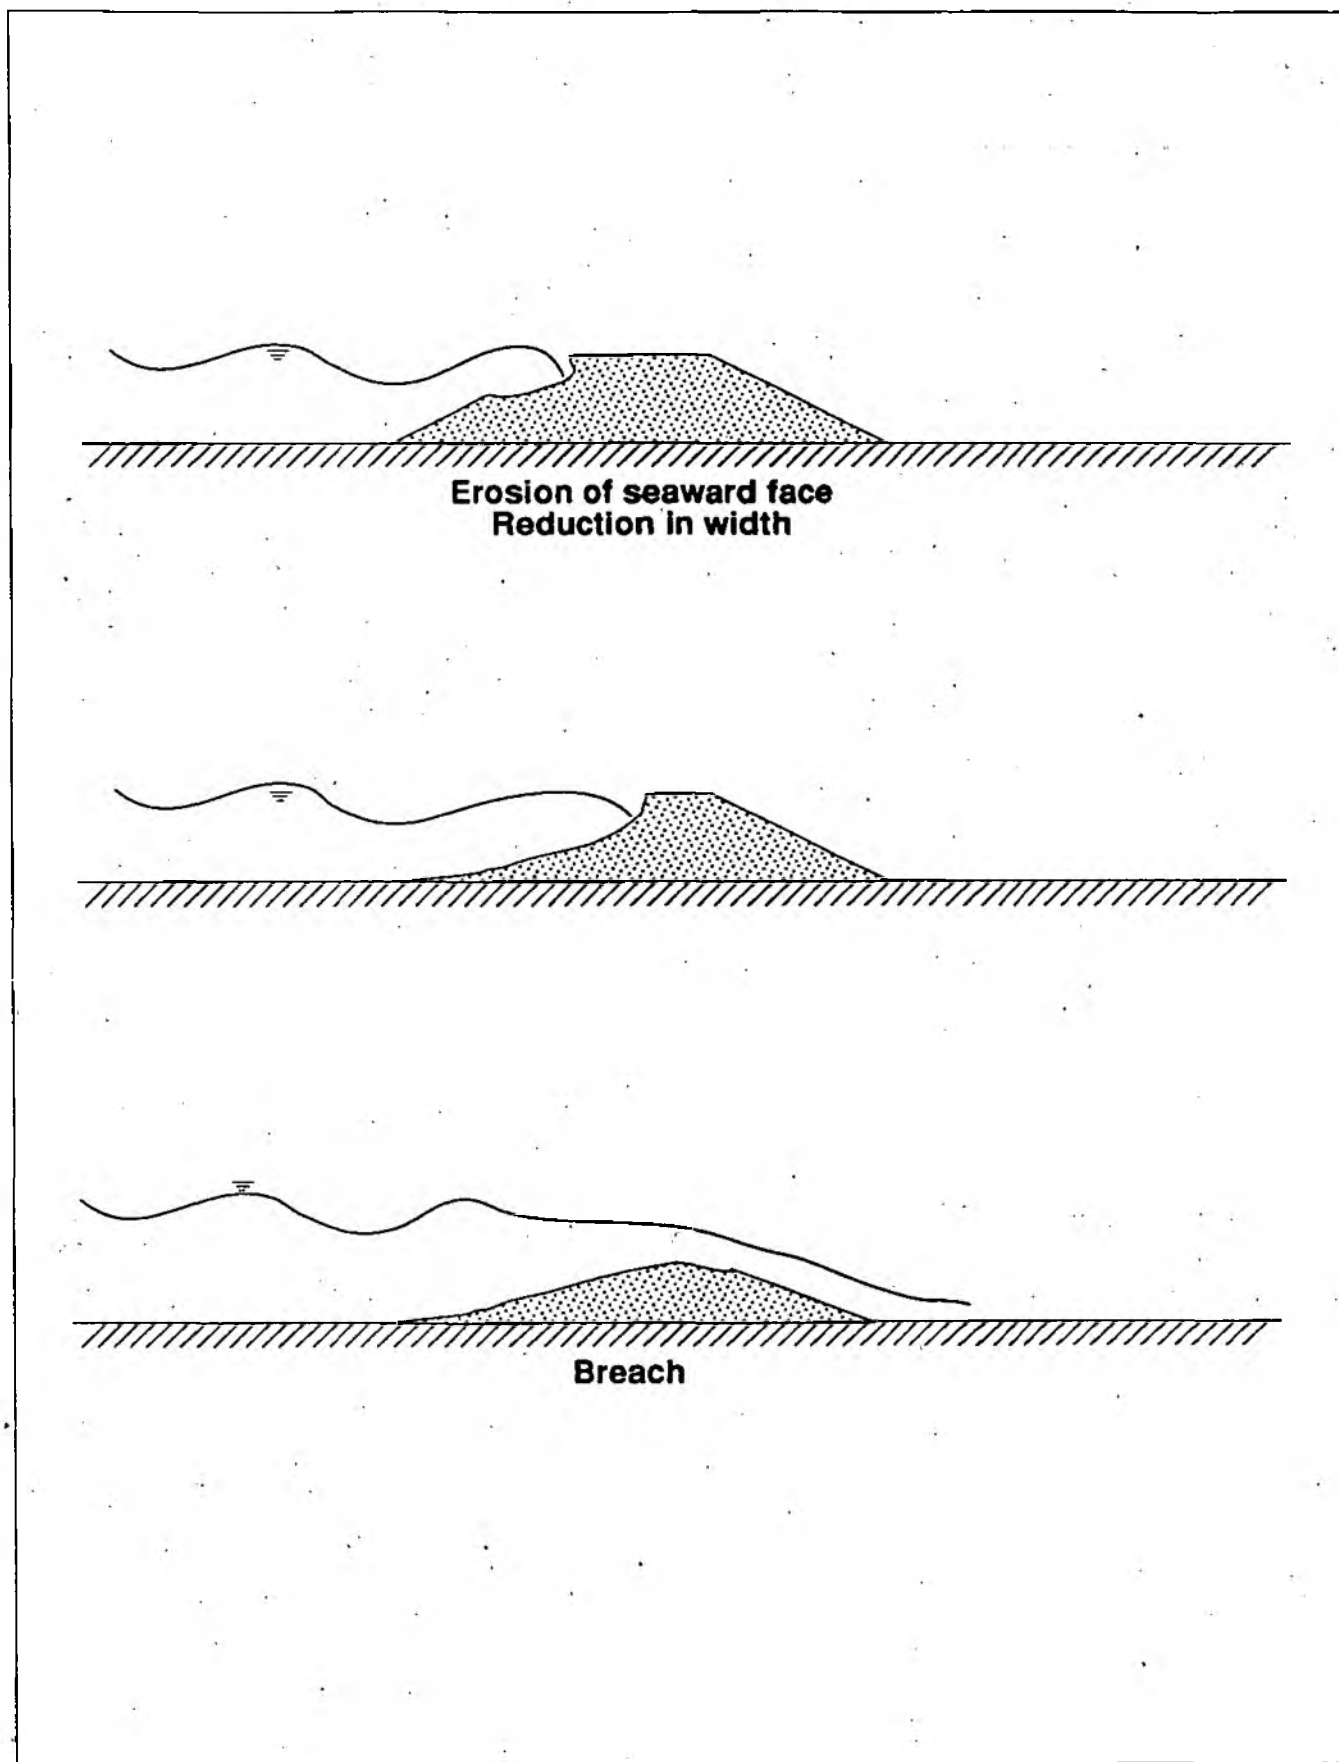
Illustrations of failure modes for an earth flood embankment (cont'd)
